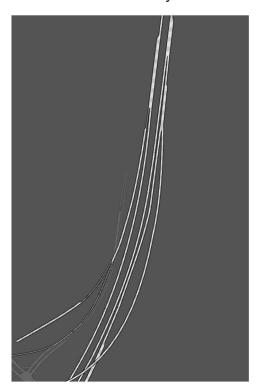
M12/Elizabeth Dr north facing ramps showing joint ramp configuration
